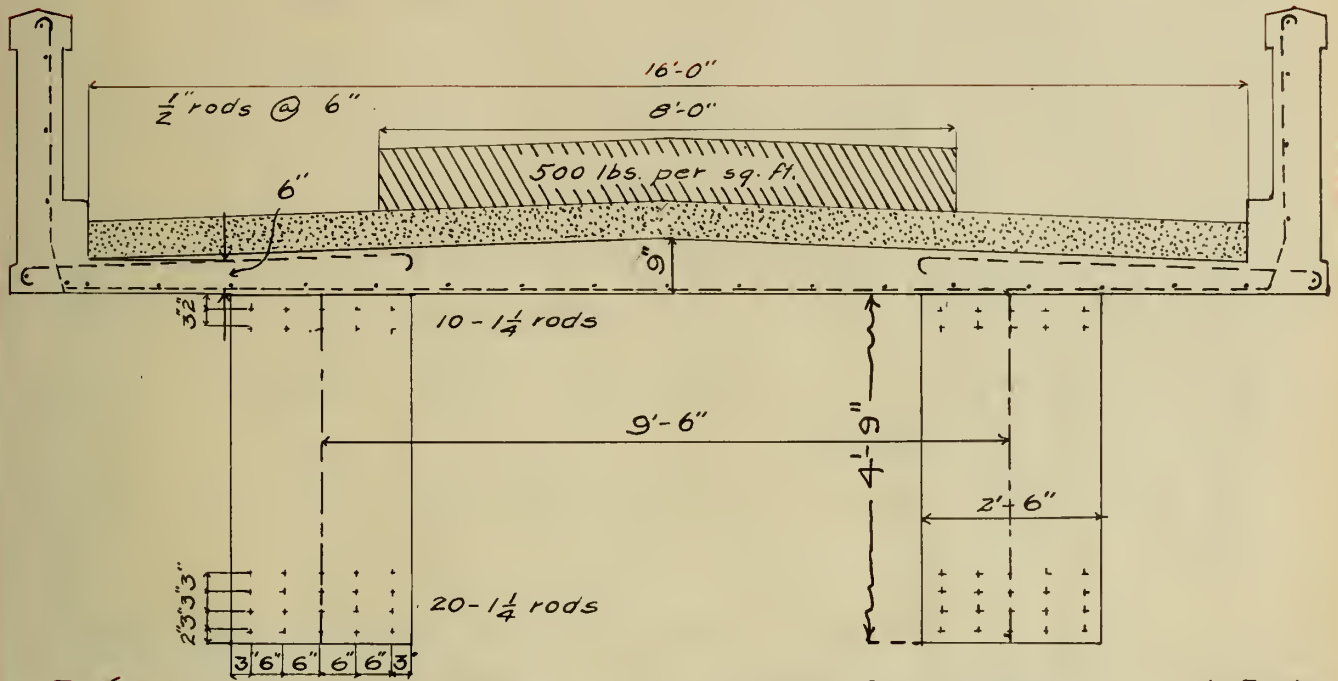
Cross Section of Slab and Girders Showing Steel and Load Due to Engine.
